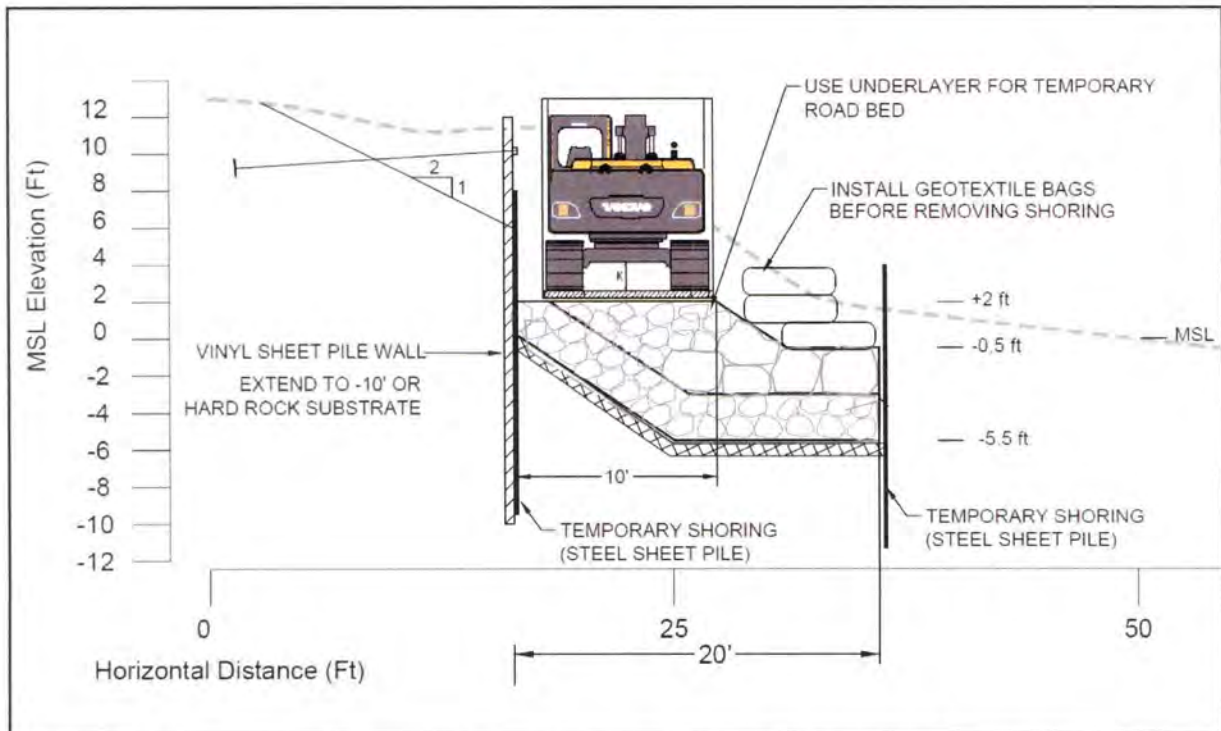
Construction of temporary road bed and structure toe – Phase 1, construction moving south.
